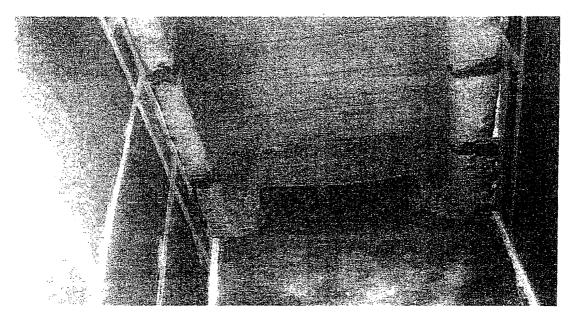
Underside of 9<sup>th</sup> Floor Deck, West End, Above 8TS1. A visual inspection conducted by looking through the access panel in the ceiling of corridor 8TS1 revealed discolored and water stained fireproofing on the underside of the 9<sup>th</sup> floor metal deck as shown above.
